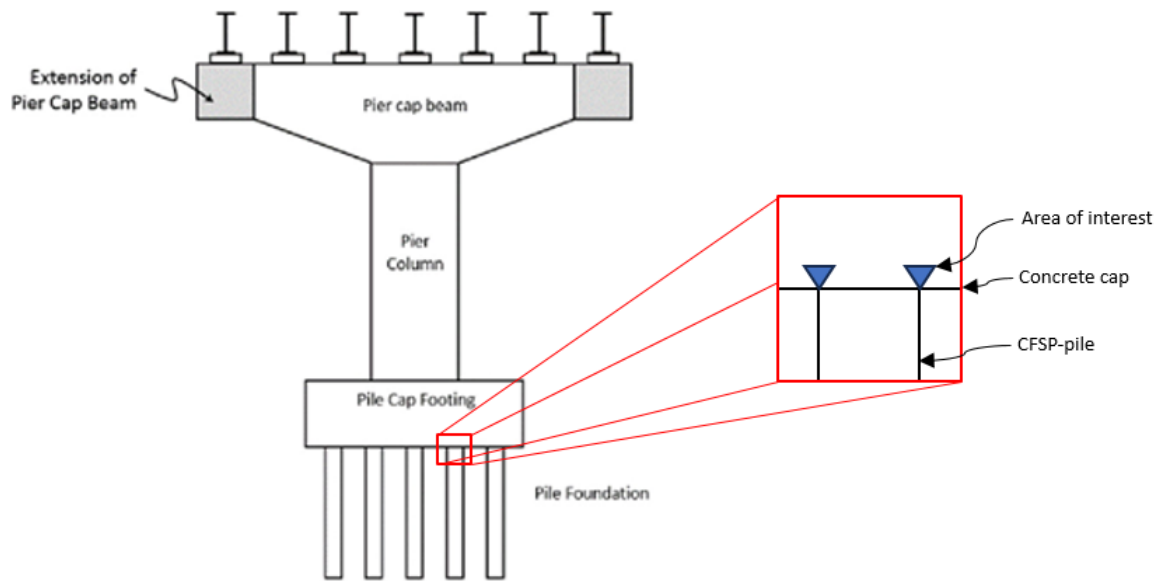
Schematisation of a typical bridge substructure (Tan et al. 2019)
